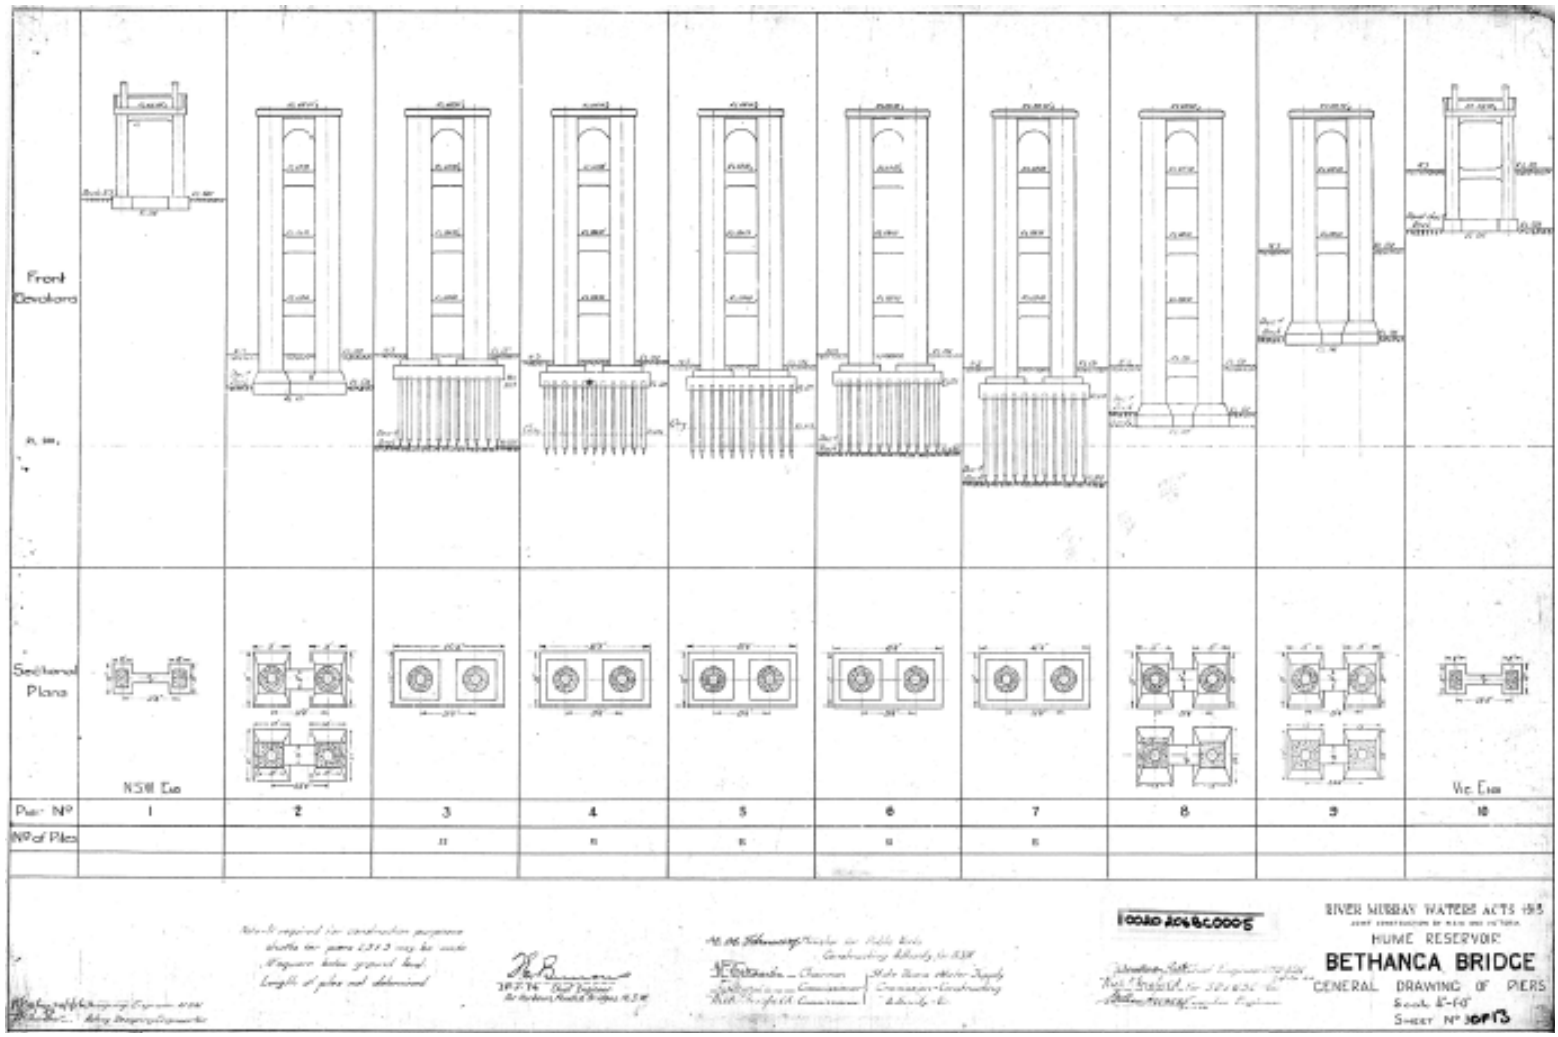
Details of concrete support towers/piers and end buttresses from the Bethanga Bridge design plans (RMS Archives).
